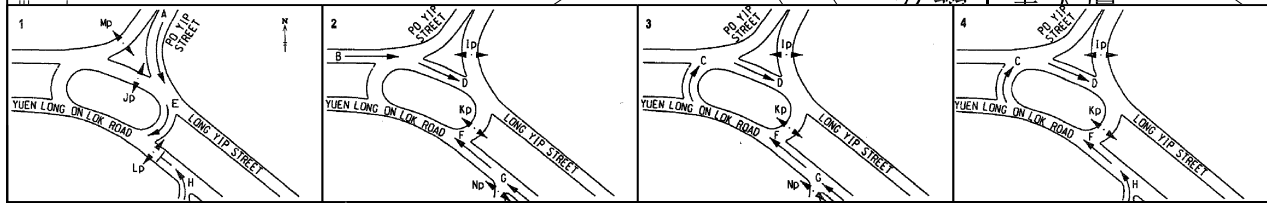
PROJECT TITLE: S16 of Lai Sun Yuen Long Center at 21-35 Wang Yip Street East, Yuen Long
